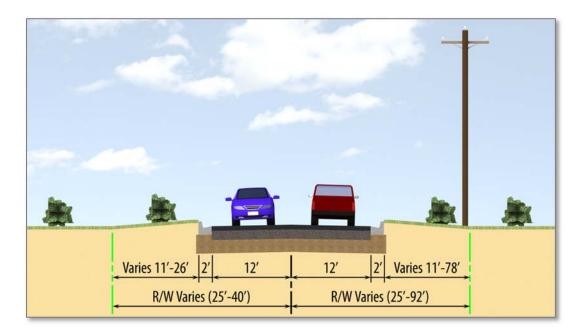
EXISTING ROADWAY TYPICAL SECTION
